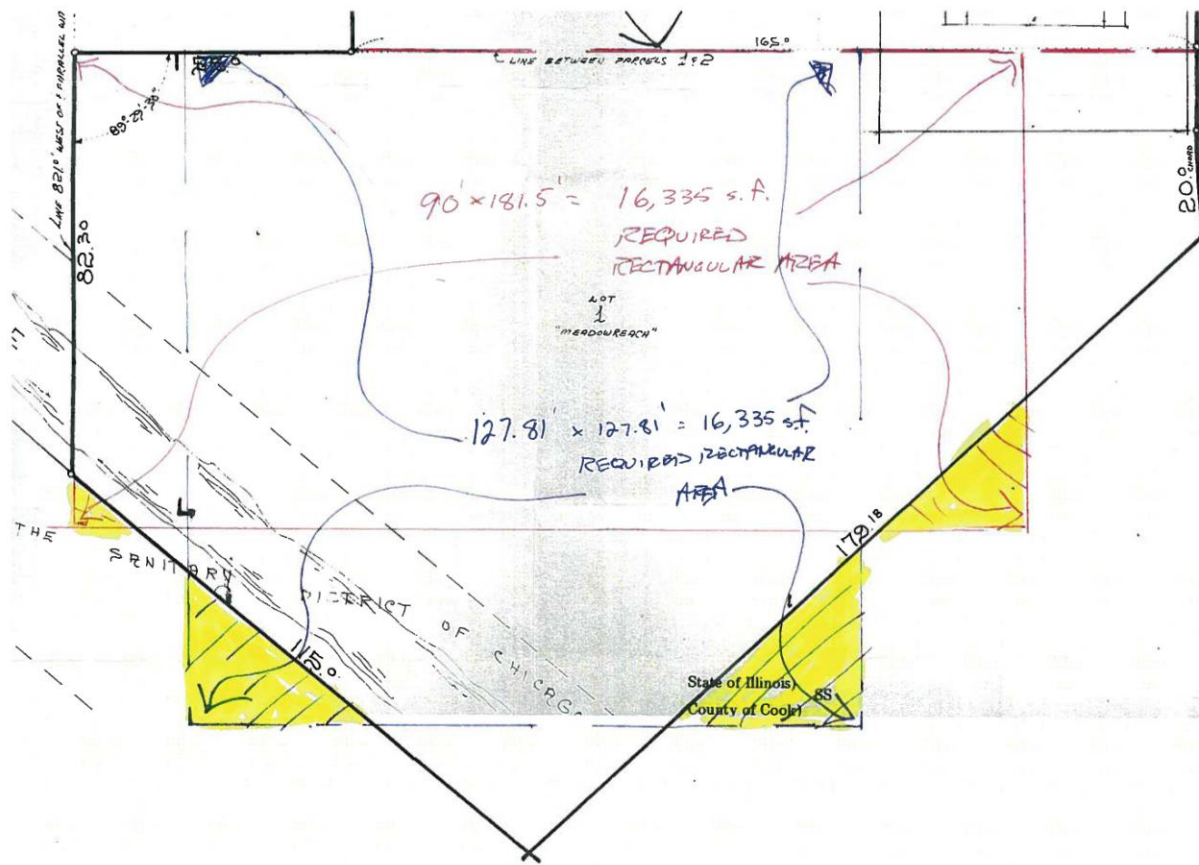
Minimum Rectangular Area – Proposed Lot 2 (South Lot)
